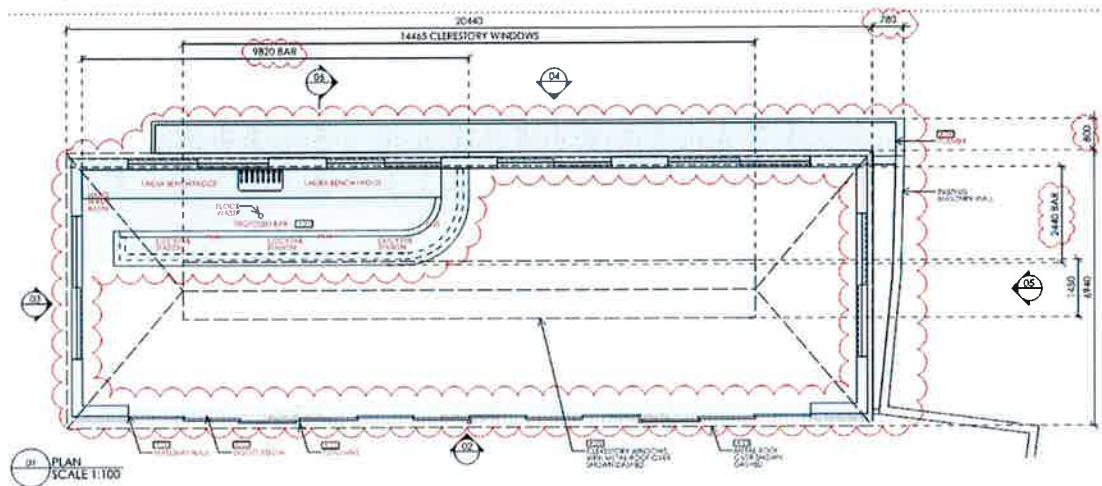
Proposed Floor Plan including internal modifications (Source: Akin Creative).
